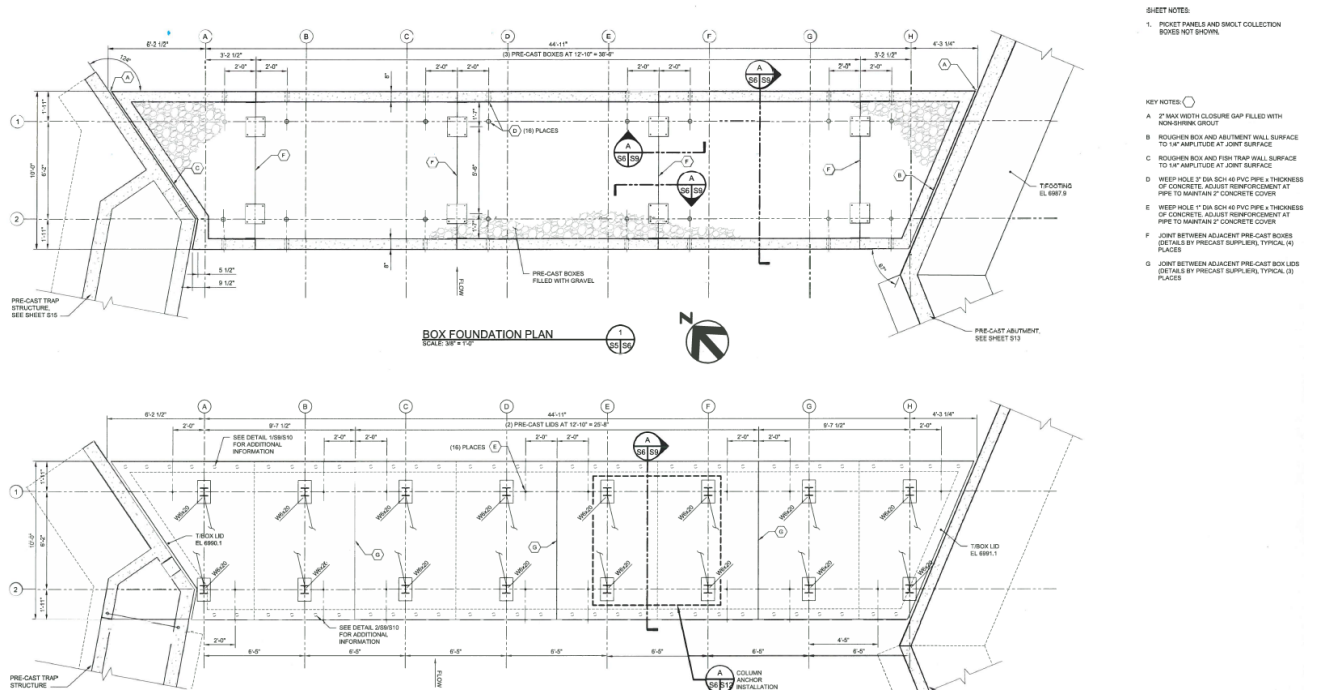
Typical sill construction (example from Redfish Lake Creek weir installation)
